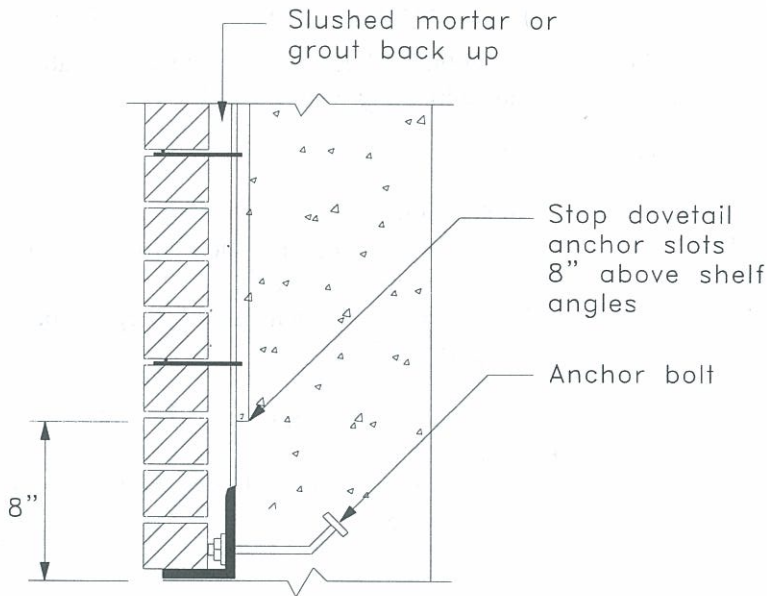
Shelf angle detail for brick veneer on concrete wall.
